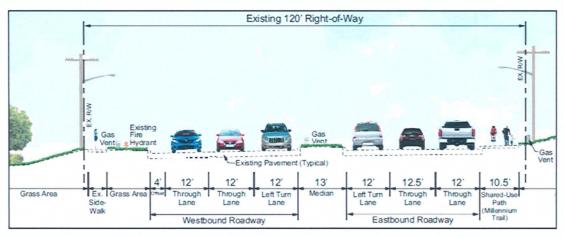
Alternative 1: No-Build. Existing Conditions along East Gude Drive at Section C-C, approximately 250' west of Dover Road.
